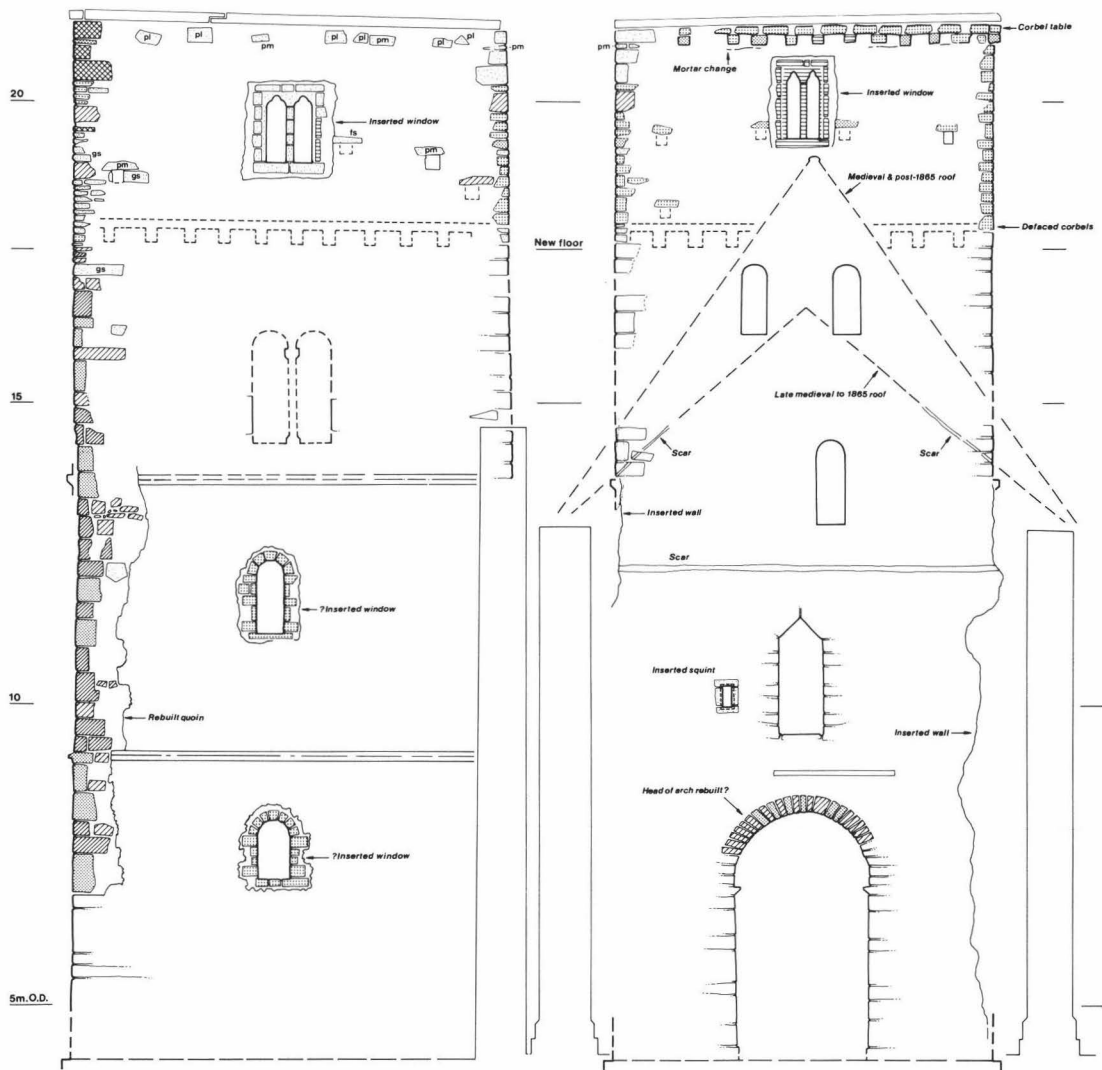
The south and east elevations of the tower showing in detail the post-conquest (Period 2) and later features. (For key see figure 7).
